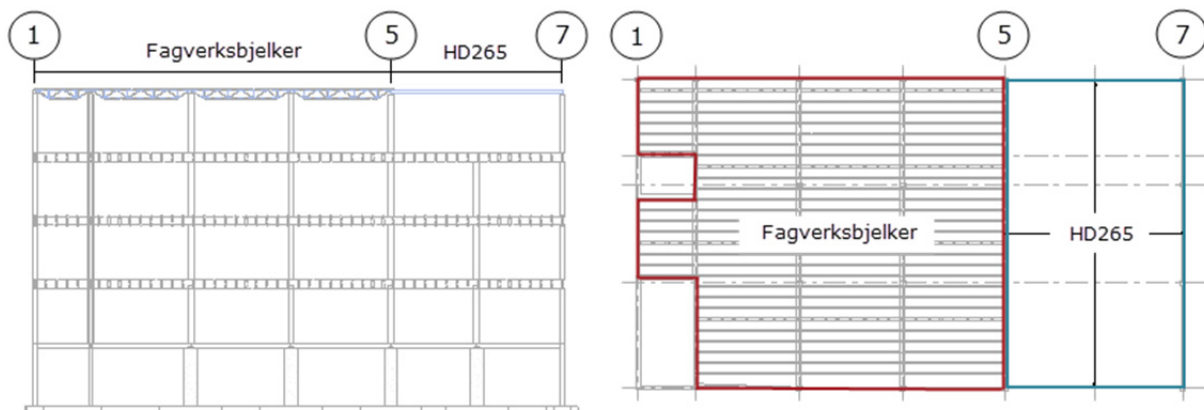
Section along east-west axis showing the wooden load-bearing structure of wooden trusses supported by glue laminated beams and columns and a detailed plan of the roof construction showing in red the part constructed in wood and blue the concrete ceiling
